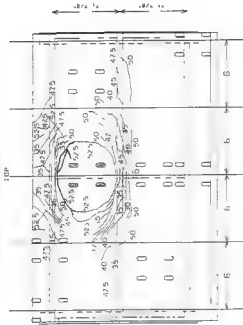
Top Cracking Pattern (Third Bridge - Test No 1)
